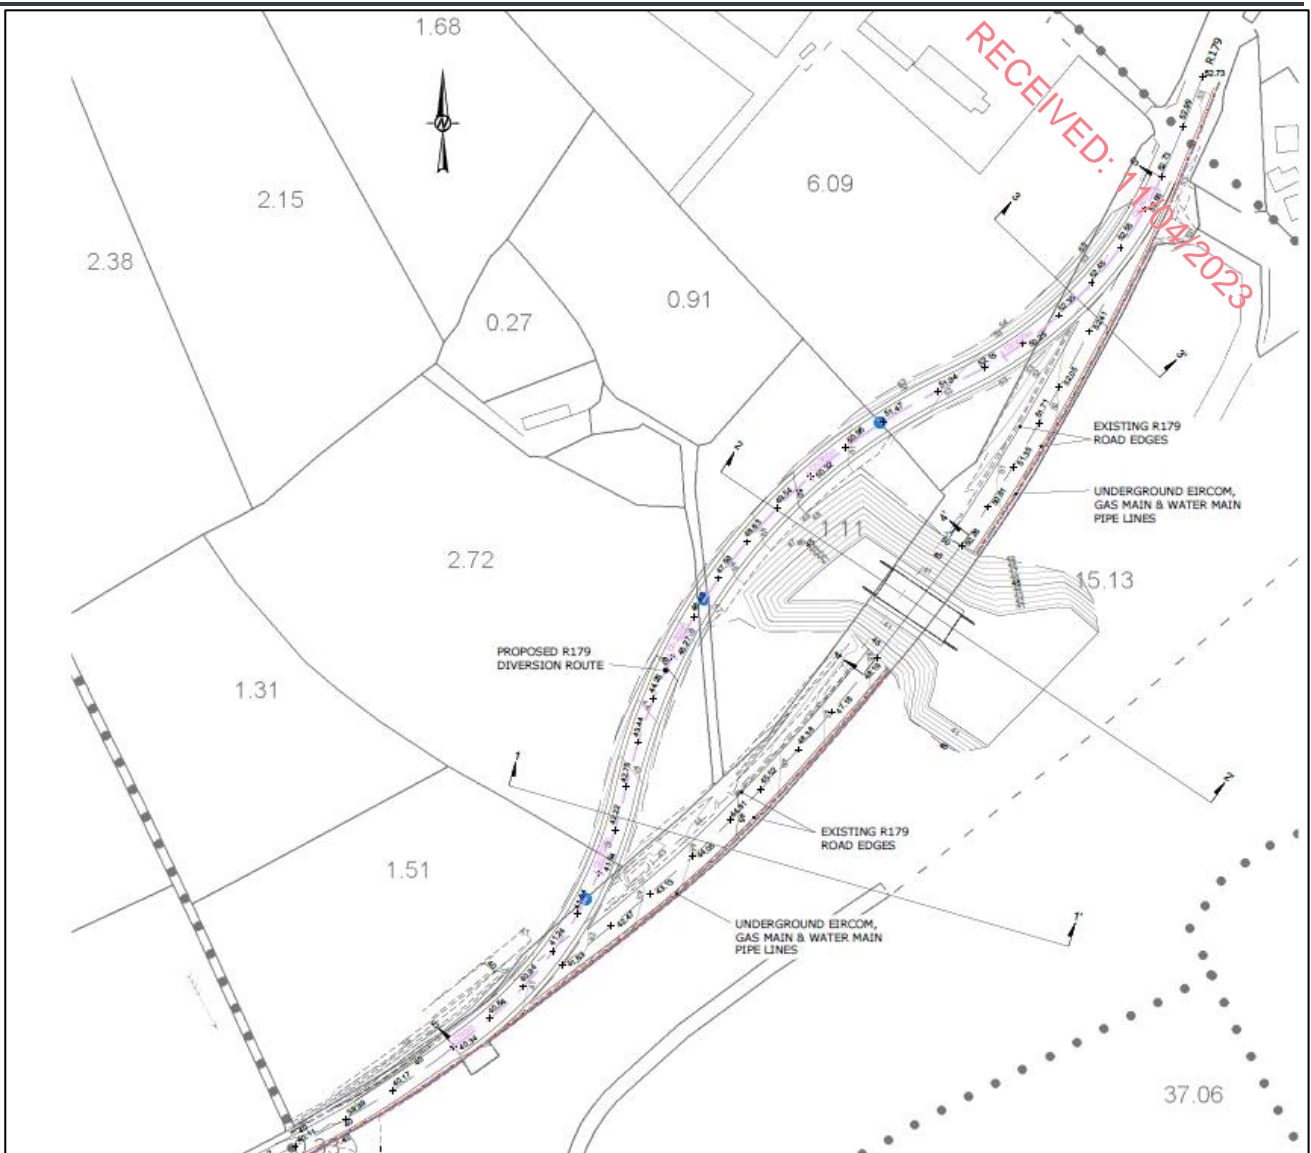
Proposed Development Site Layout showing Cut-and-Cover Tunnel
